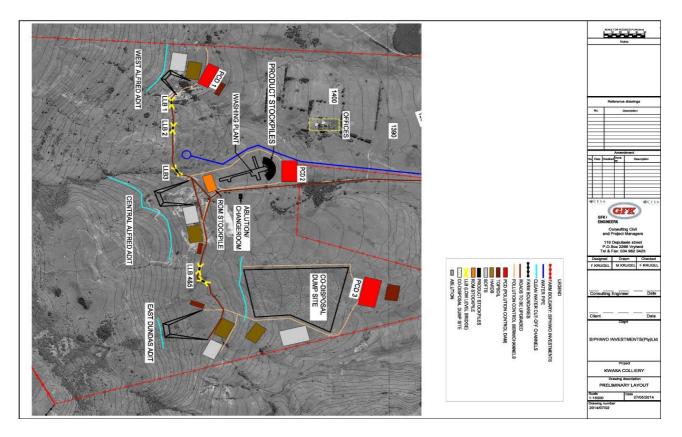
LAYOUT PLAN OF THE MINING AREA
